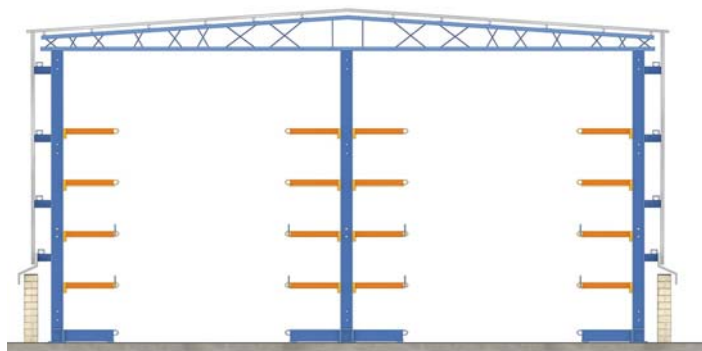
Cantilever *rack* (*Rack em Viga* – Mecalux)
